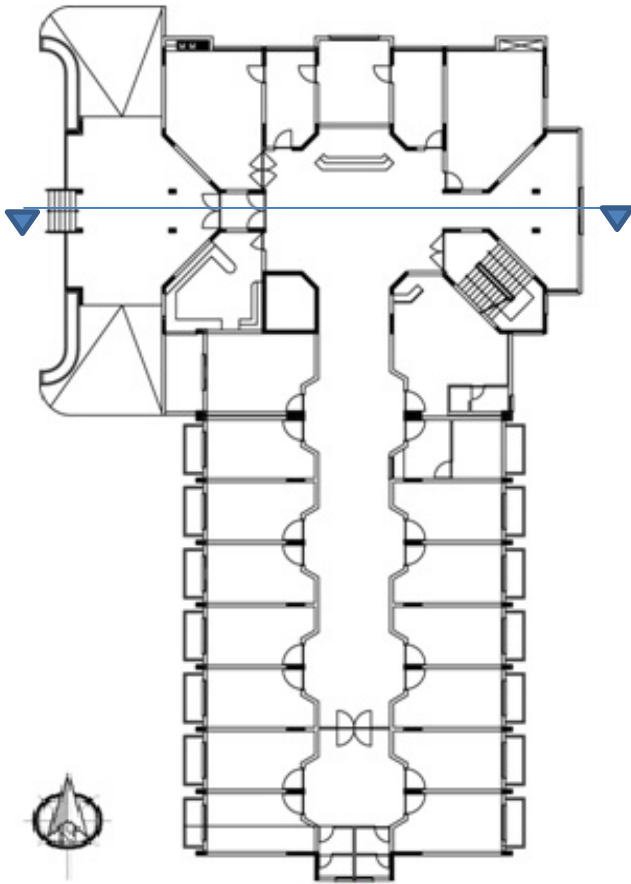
First Floor of Health Centre Building (SC 1/500)
